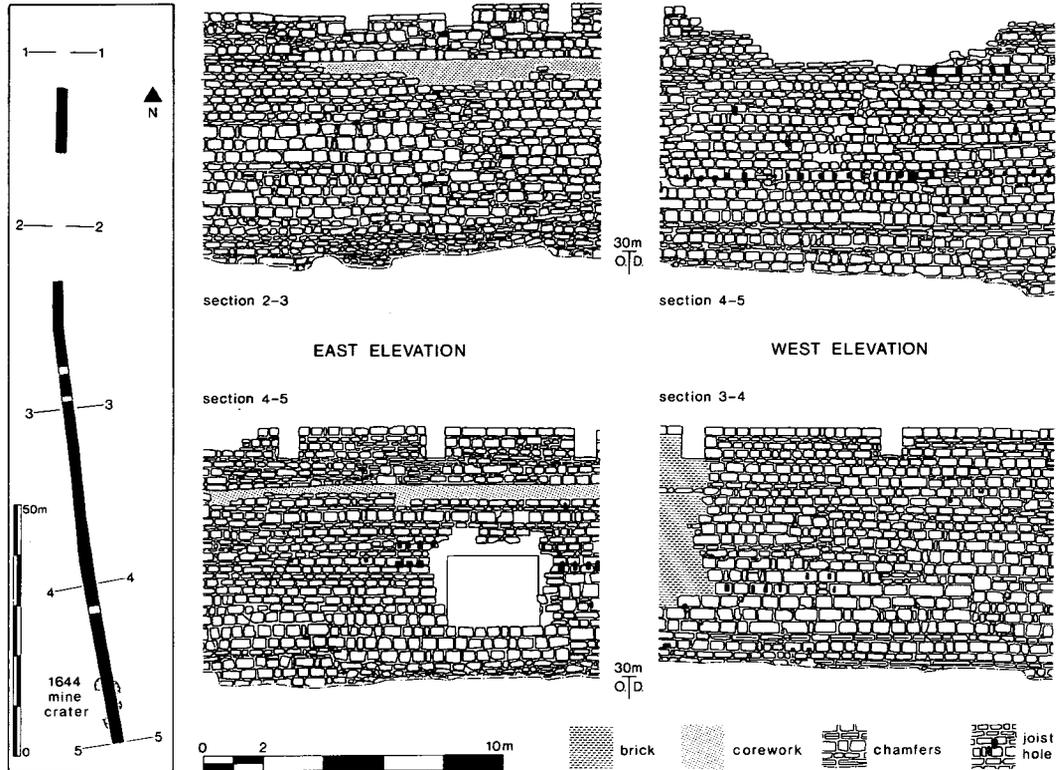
Location (inset) of phased elevation sections (figs. 3–6) and masonry details of areas outlined by shading.
